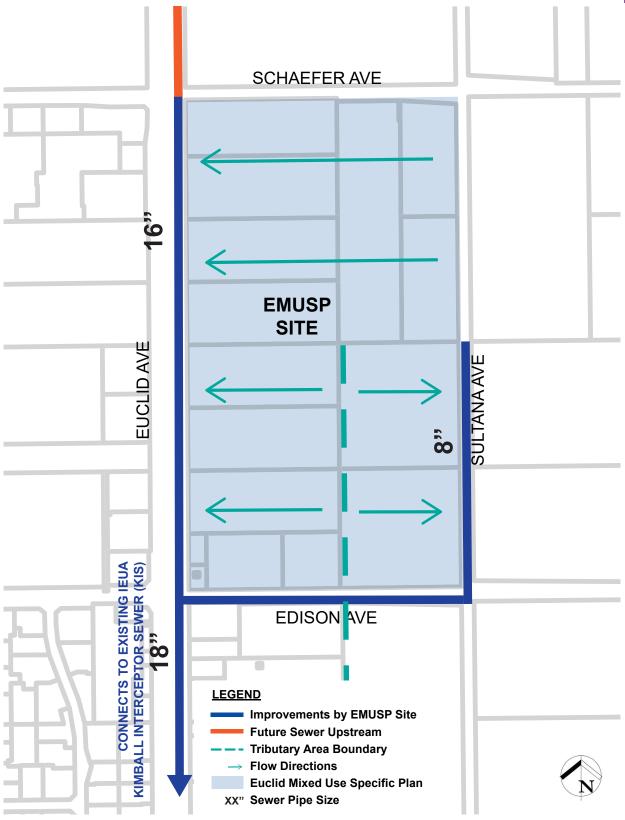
CITY OF ONTARIO OVERALL SEWER PLAN
